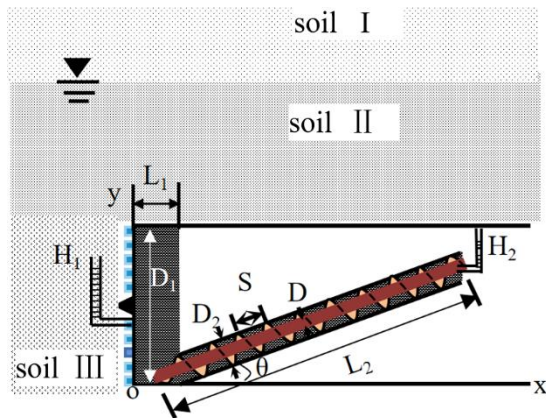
Seepage model of shield pressure chamber-screw conveyor
